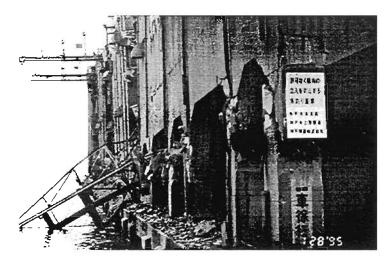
Damaged columns of warehouses at the Shinko Pier in Port Kobe
